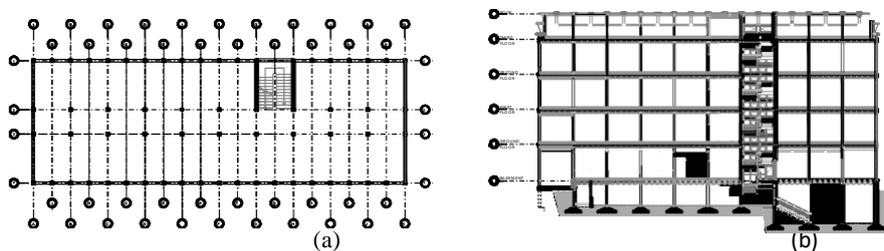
(a) Existing base plan (Source: ARTING drawings); (b) Section drawing (Source: EPTISA drawings);
